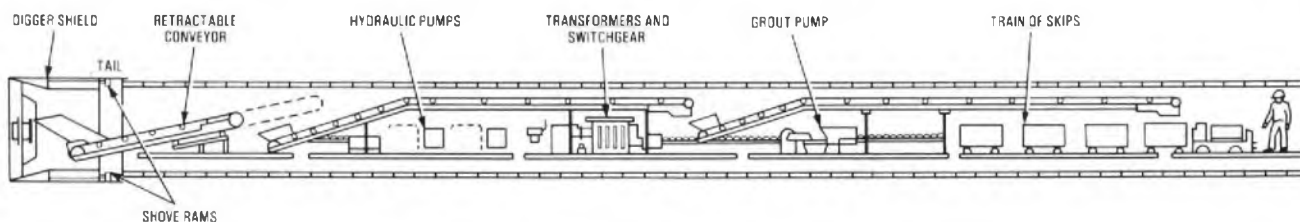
Sectional drawing of the Sir Robert McAlpine full-face tunnelling machine
